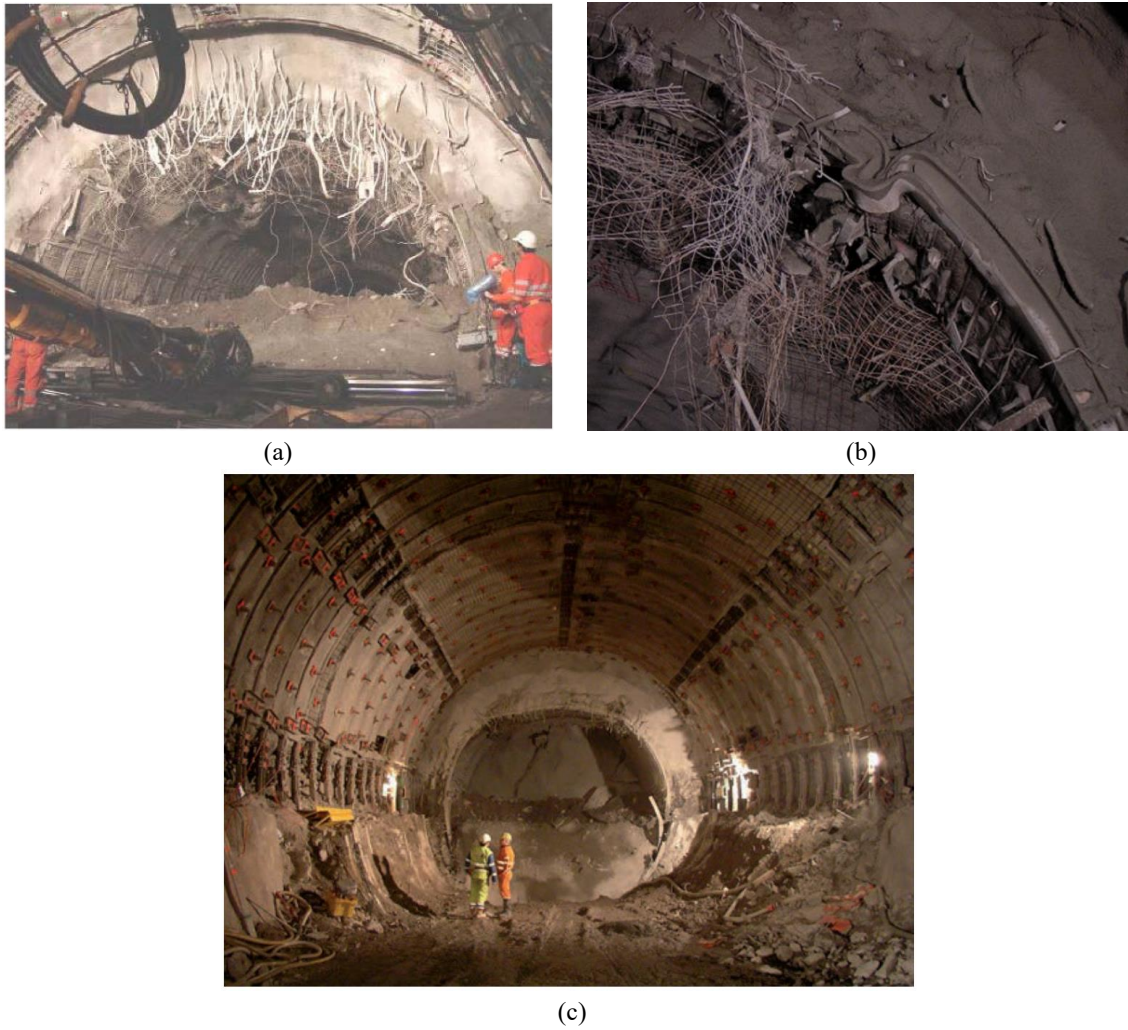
(a) Destruction of support system by squeezing rock mass before installation of yielding elements; (b) close view of buckled HEM 180 arch with “suitcase fold”; and (c) Enlarged tunnel section and installation of LSC elements into the shotcrete slots and between TH bell profile steel sets with an old, smaller and deformed initial profile in the background in the Gotthard Base Tunnel, Switzerland.
